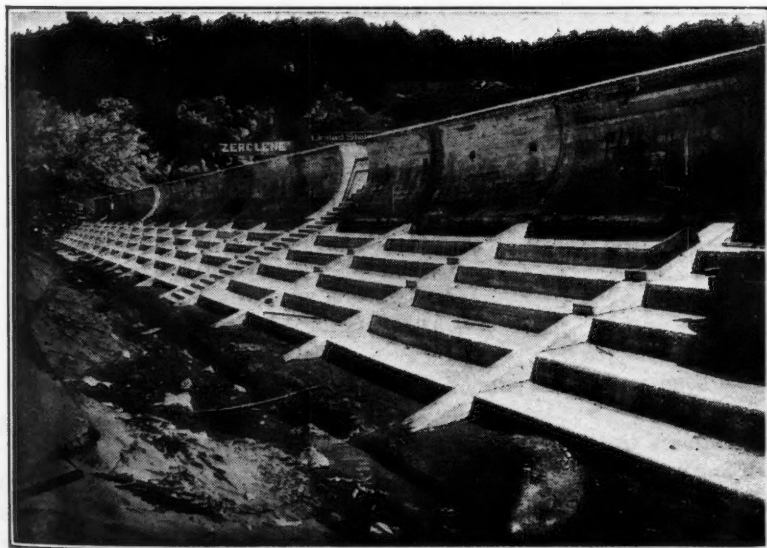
SAME LOCATION, WITH BLEACHERS AND ROLLWAY CONSTRUCTED.
